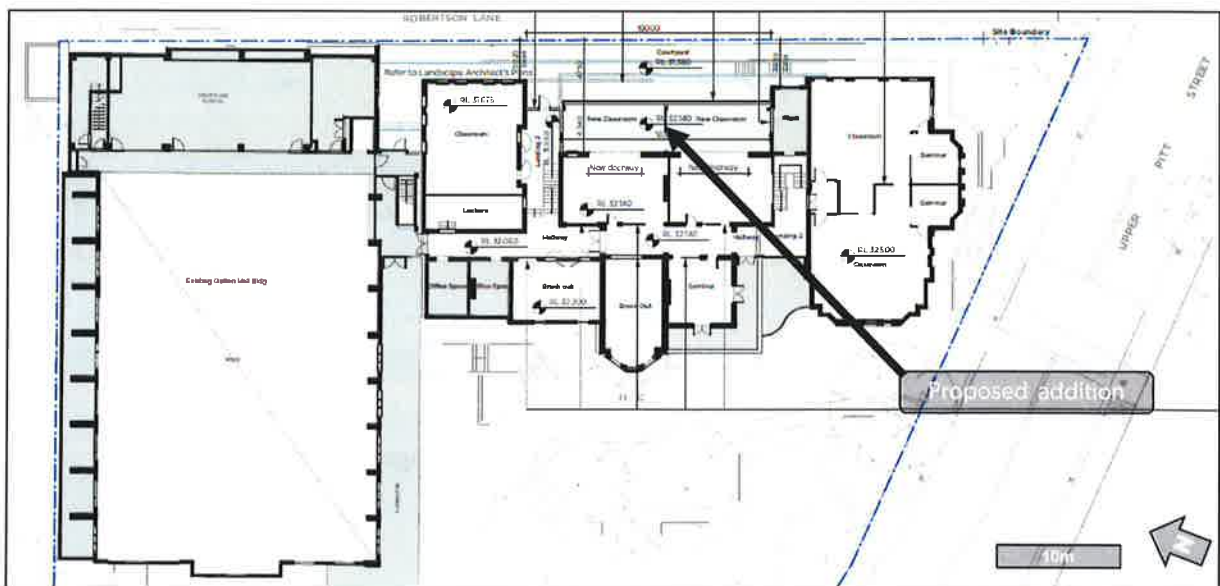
| Senior Campus – Proposed Site Layout (Source: Applicant’s EIS 2018)
